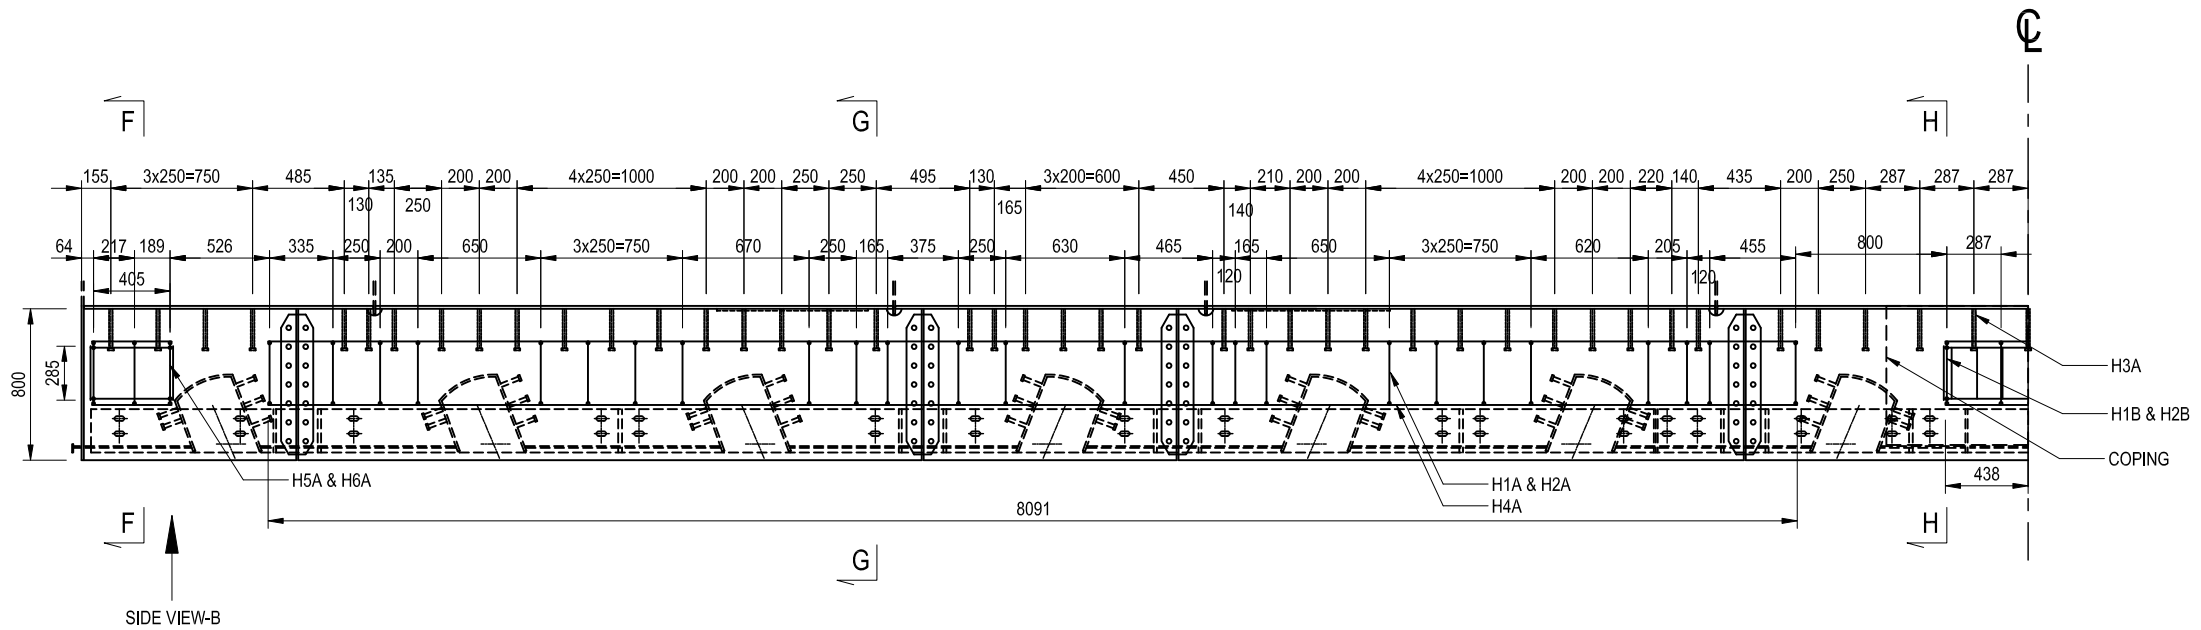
DETAIL OF STEEL GIRDER END FOR EXPANSION JOINT (P20) (1) S= 1:70
